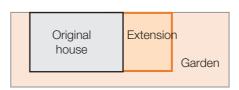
Overall extension footprint must not exceed 50% of the original garden space.
